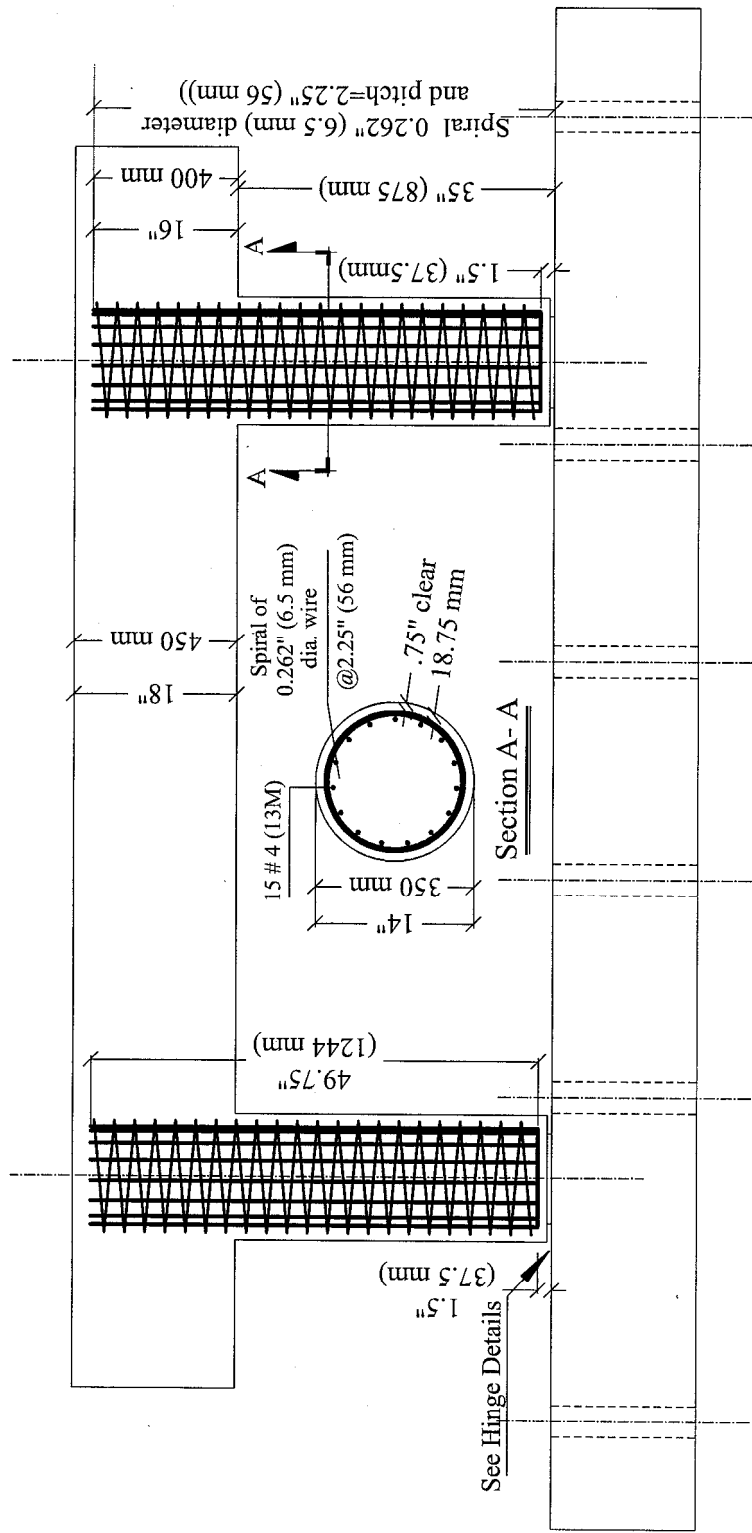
Columns Longitudinal and Transverse Reinf. of Specimen B2CS
